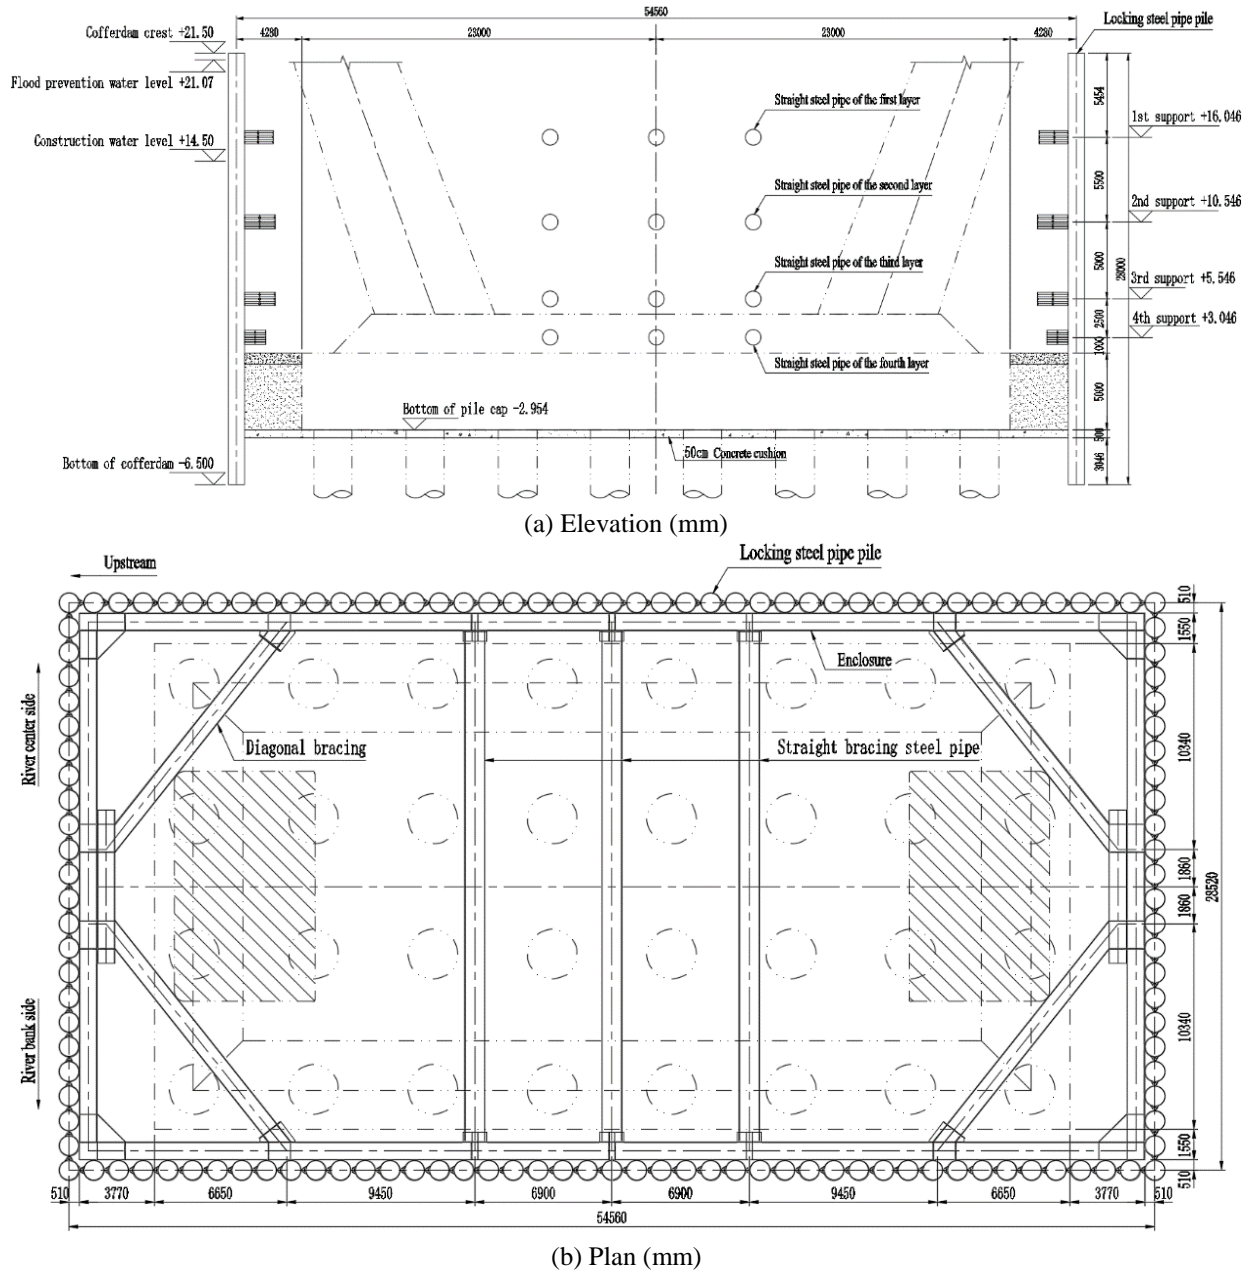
Layout of Cofferdam with Locking Steel Pipe Pile
